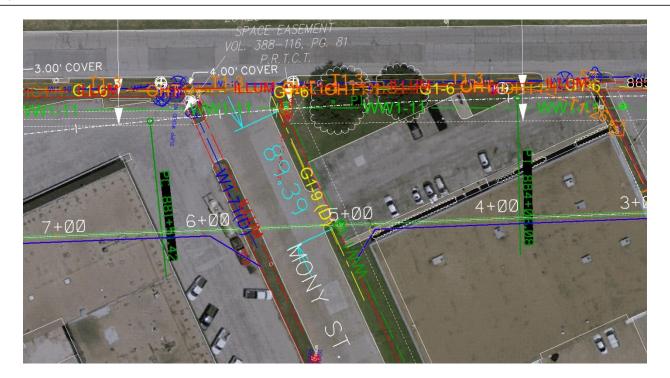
Detail - Distance from the existing Manhole connection at Mony w/ SBFR to proposed manhole.
